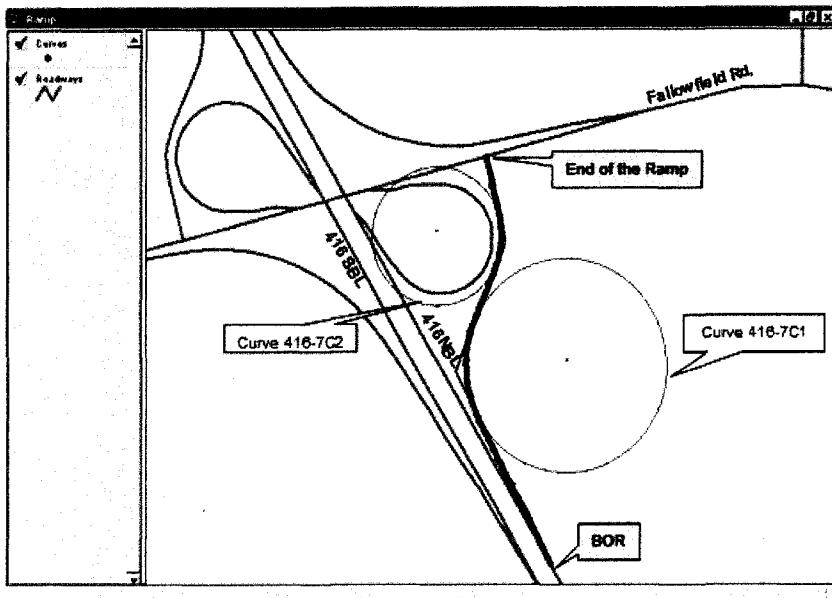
Exit Ramp of Highway 416 (Ramp 4).
